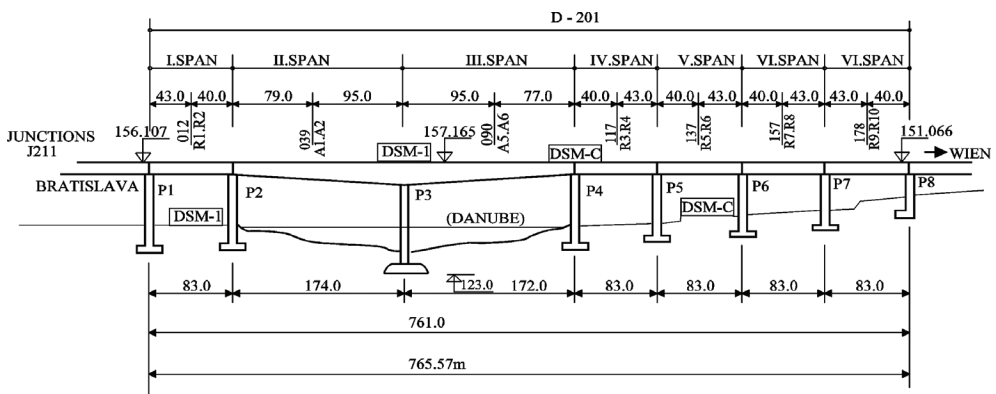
Longitudinal section of the Lafranconi highway bridge over the Danube in Bratislava.
